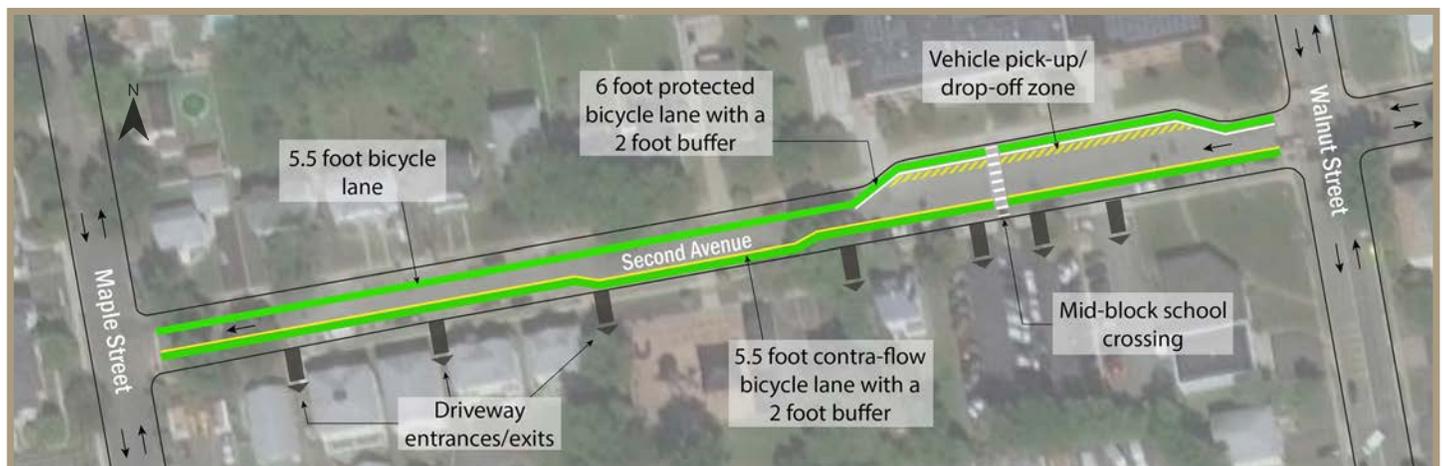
Plan view of the proposed bicycle lanes on Second Avenue between Maple Street and Walnut Street.
